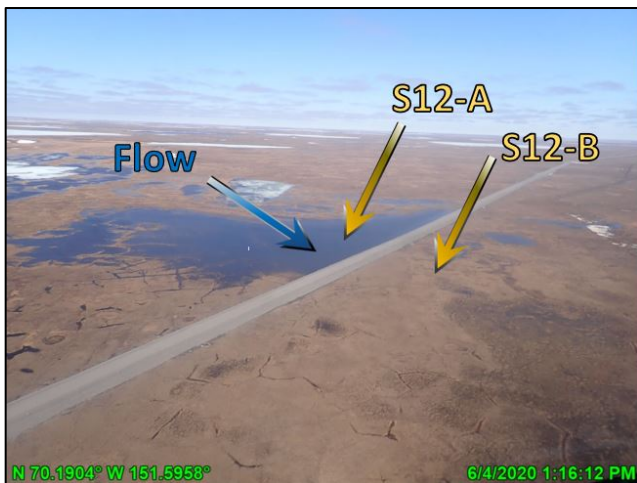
Ponding near S12 behind blocked culverts, looking east; June 4, 2020
